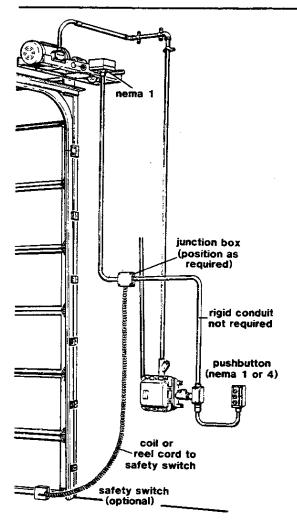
Typical Mounting Arrangement Power Input and Motor Wiring of Explosion-Proof Operator
